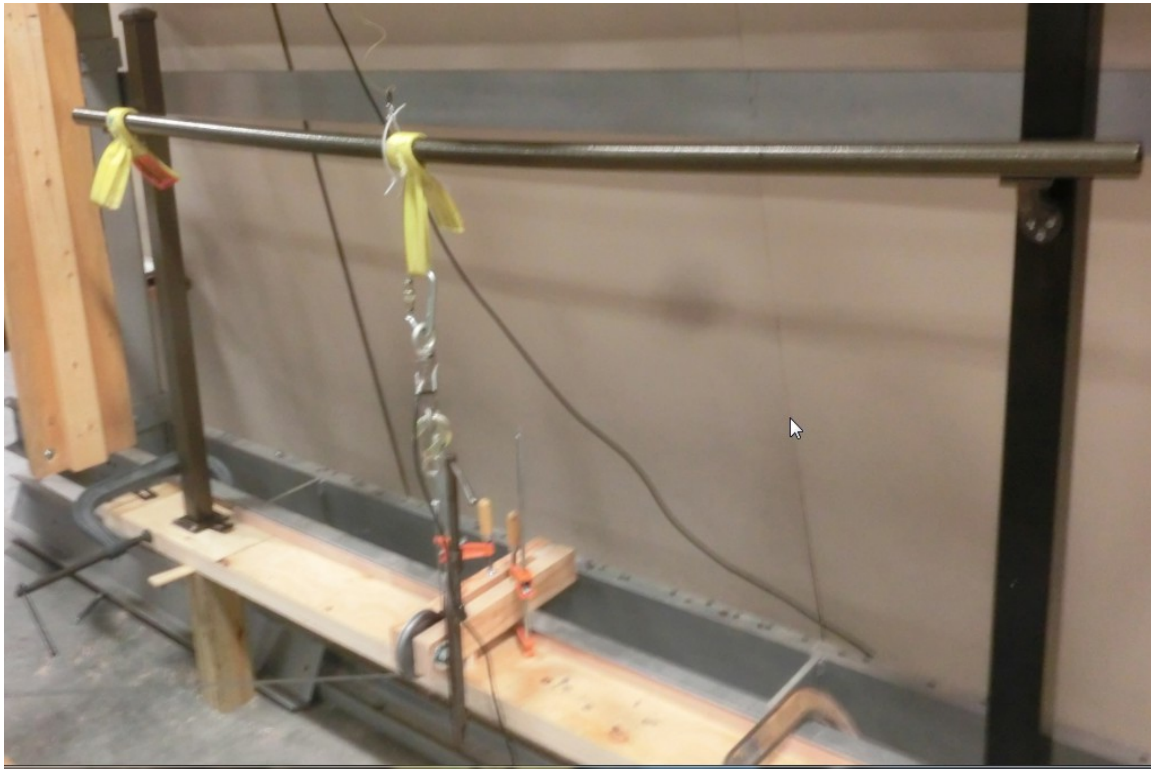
Typical Setup for Horizontal Concentrated Load Near Support
